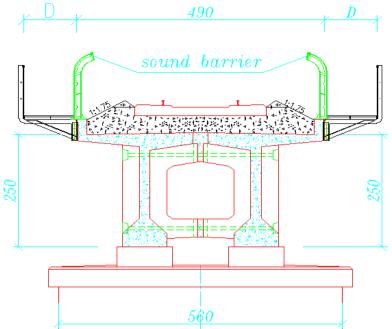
Design for the precast T-Frame girder and noise deflector
